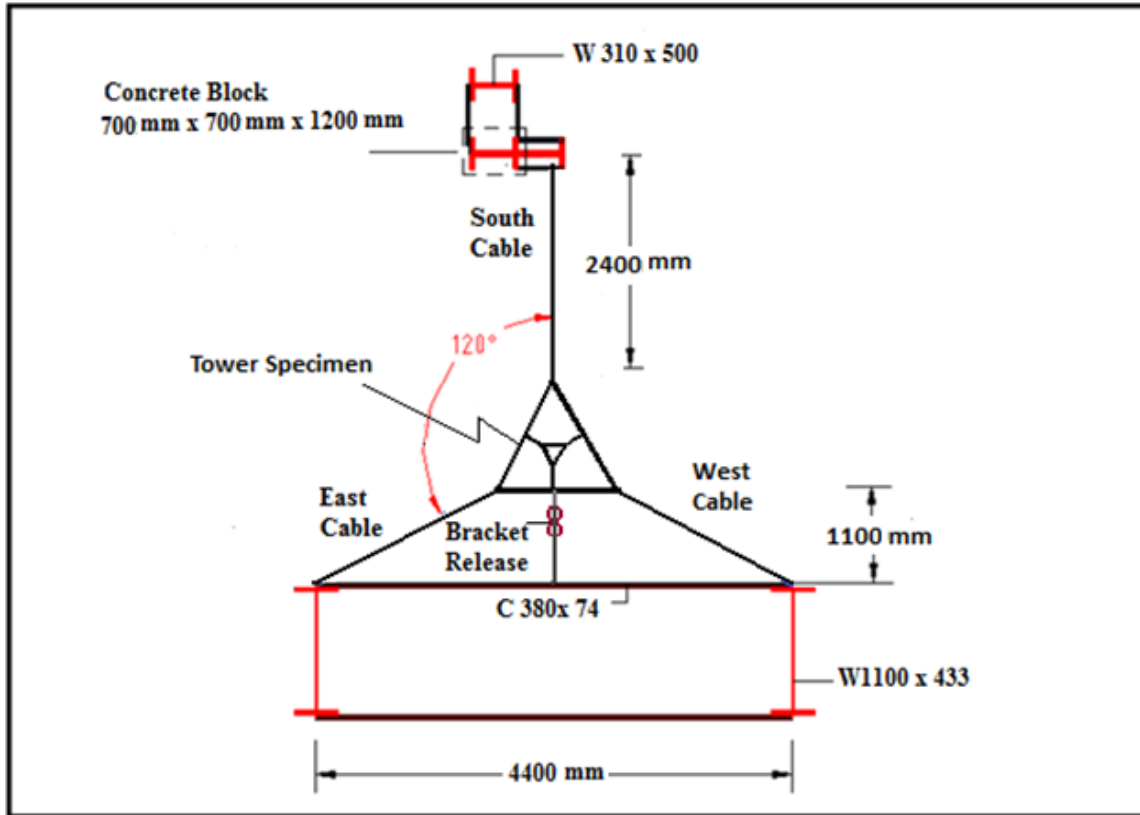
Plan view of FRP tower dynamic test set-up
